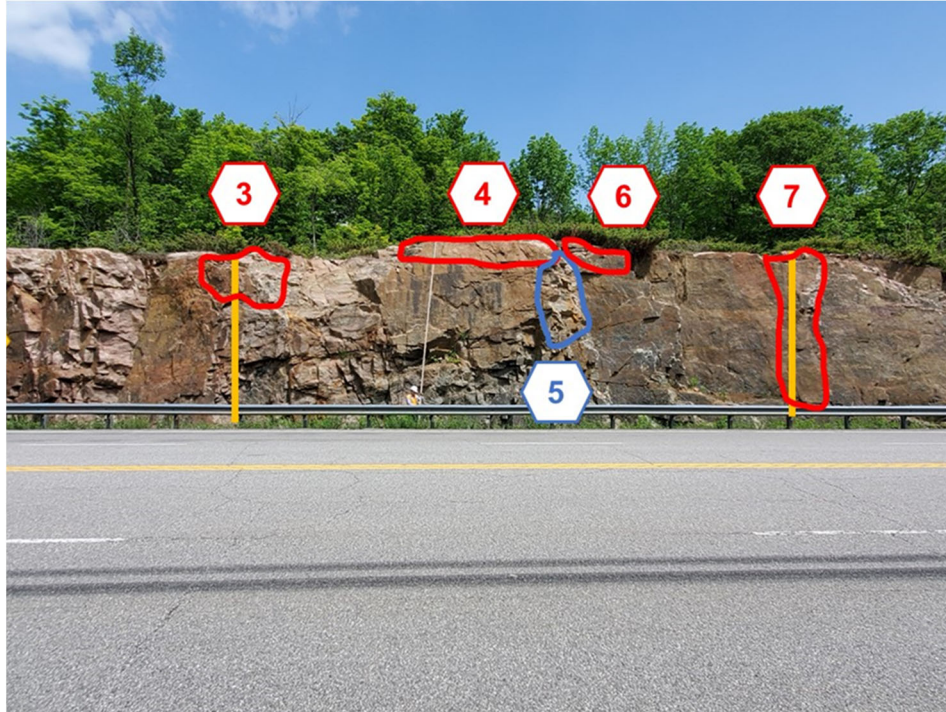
Existing Rock Cut Site E-17-1, near 12+640 Left (2020/06/09)
